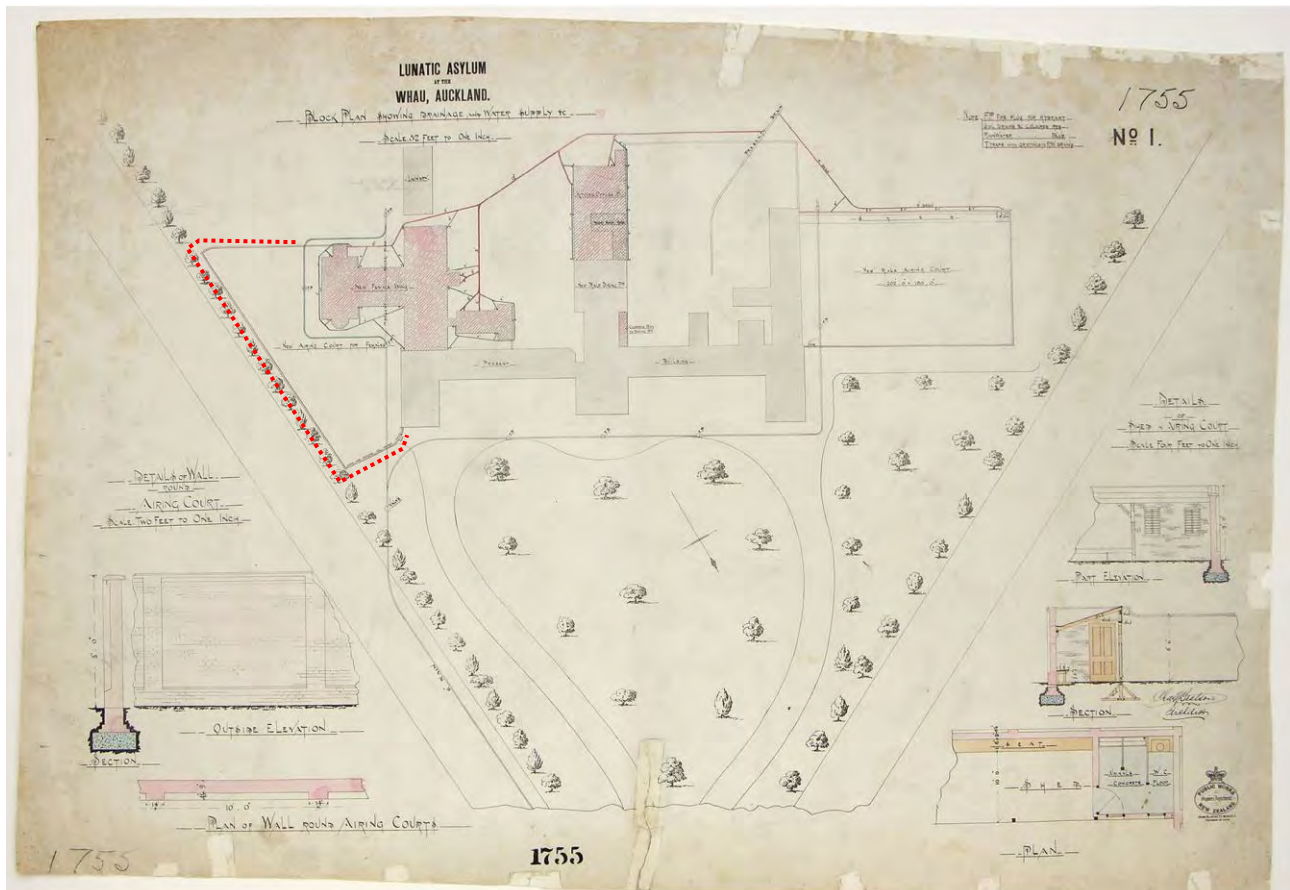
1886 plan of 'Whau Lunatic Asylum' showing the alignment of the 'airing court' wall, dashed red line (Architecture Archive 33987 GI\_006)
